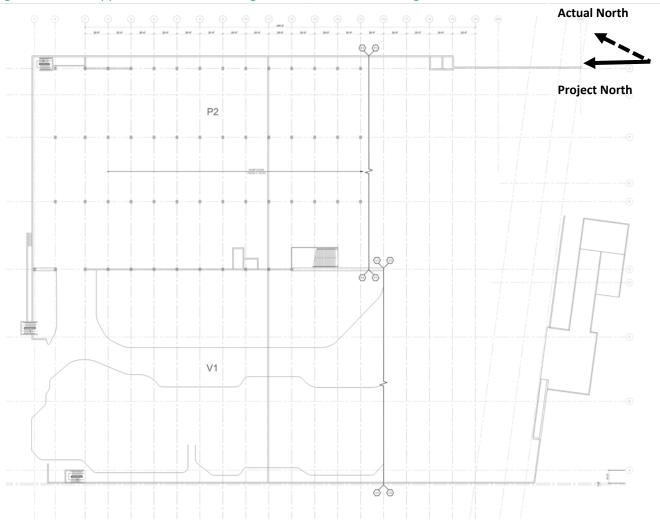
Upper Village and Partial Lower Village Levels, South Pier Parking Structure
